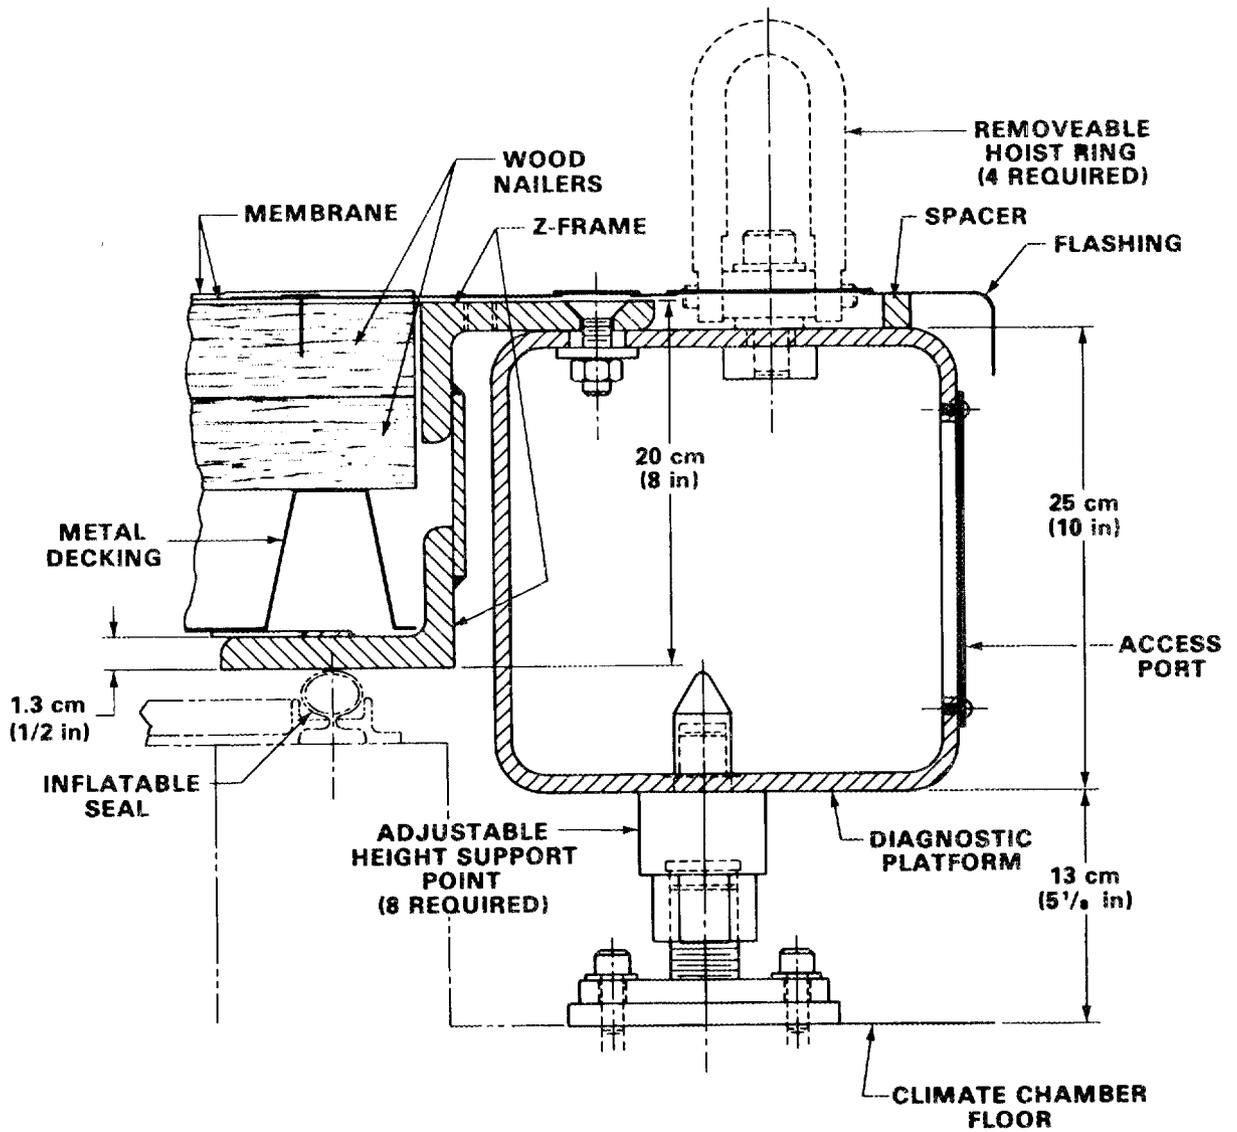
Cross-section drawing of the Diagnostic Platform and Z-frame.
